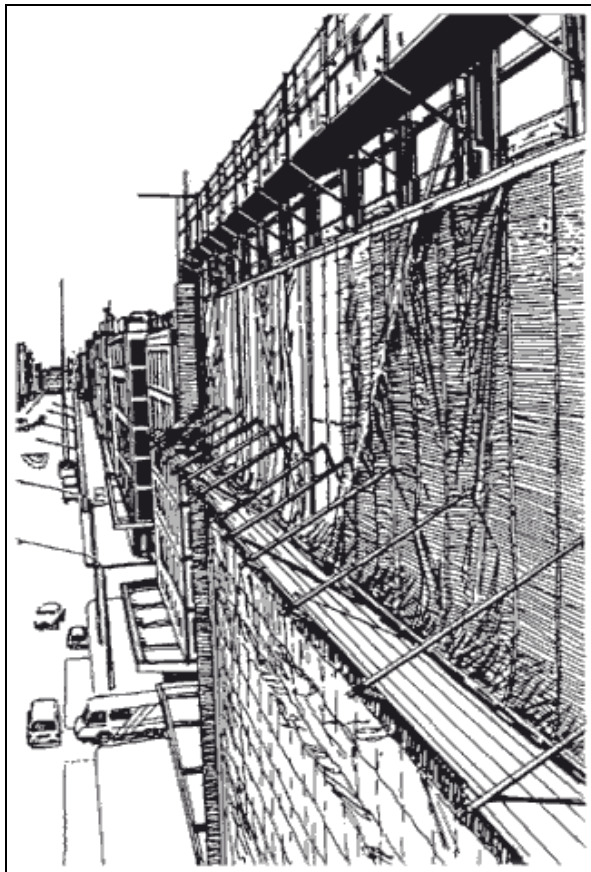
A single pole or putlog scaffold, with a single outer row of uprights or standards and which is partly supported by the building
